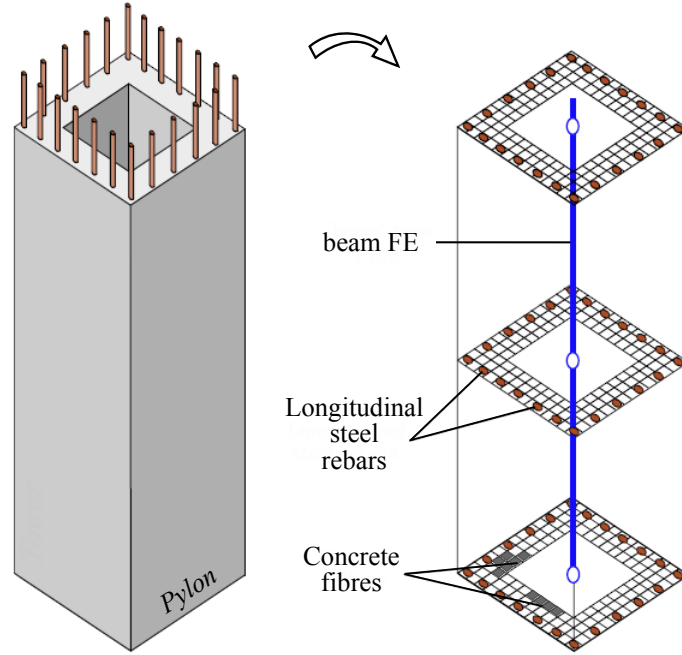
Finite element model of the pylon section having adopted the fibre section model (taken from Camara (2011)).
